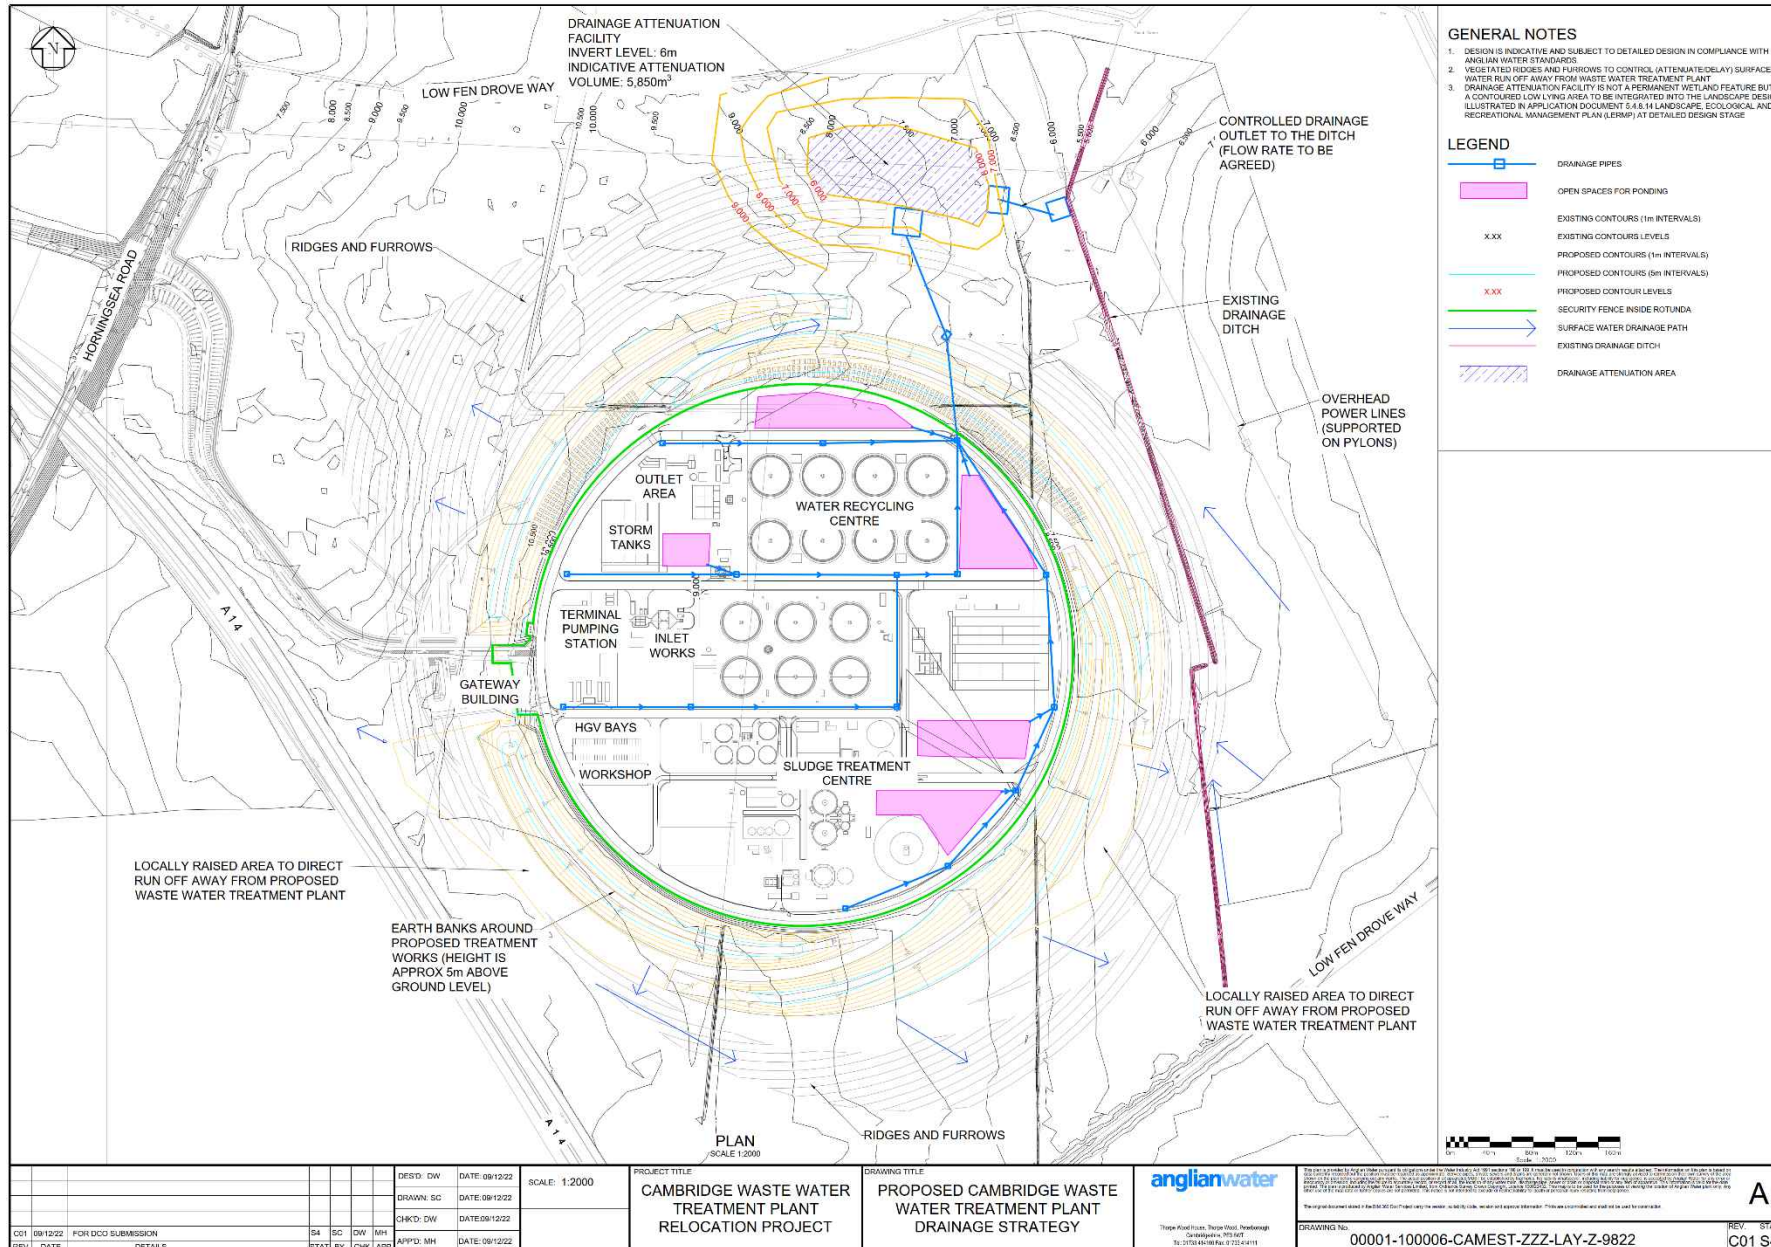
Strategic Drainage Plan for the Proposed WWTP Area
